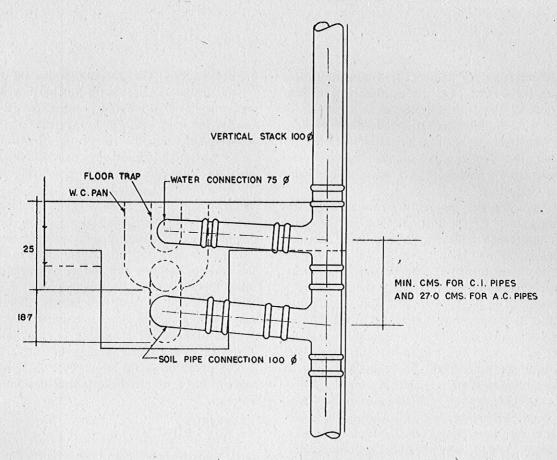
EXTERNAL ELEVATION OF SINGLE STACK
